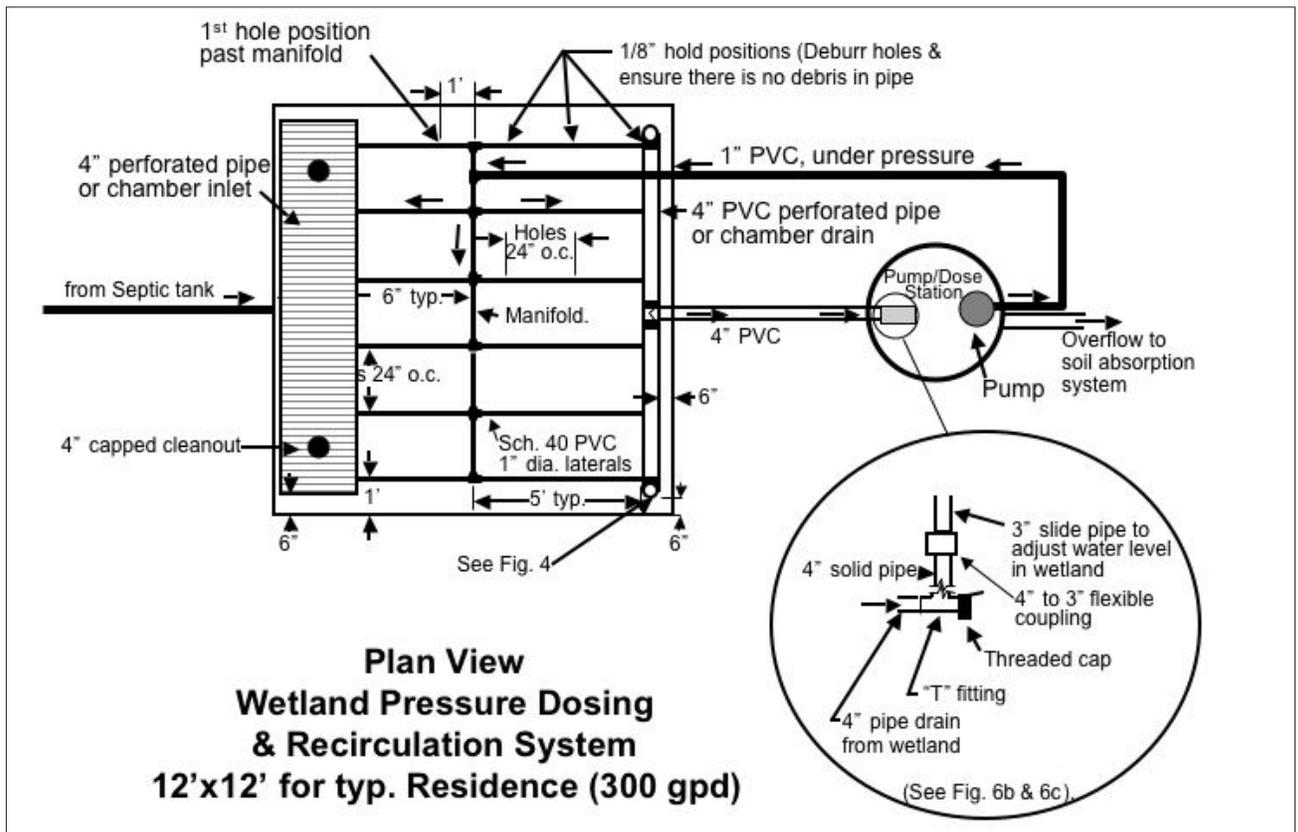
Top sectional plan view of a RVF Constructed Wetland.
